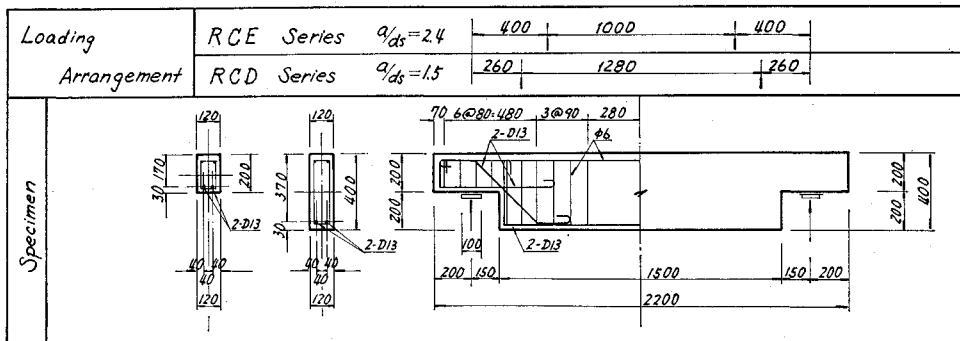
Specimens and loading arrangement of reinforced concrete rectangular beams (two points loading test).
